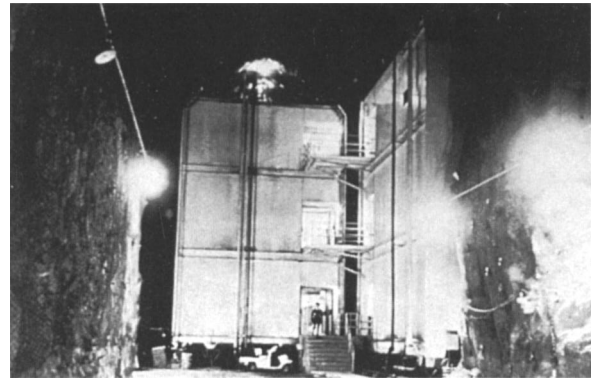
Typical tunnel cross section and interior three-story building at Cheyenne Mountain complex (permission: US Air Force Space Command).
